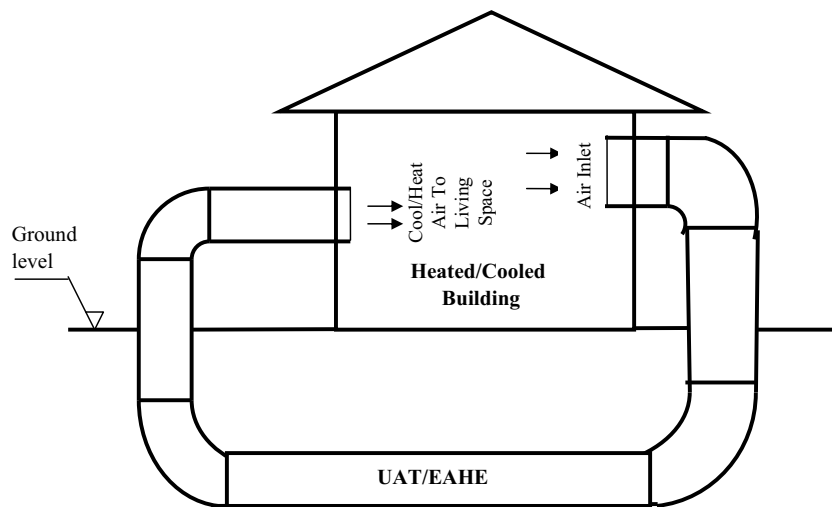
Schematic of closed loop EAHE (underground air tunnel).
